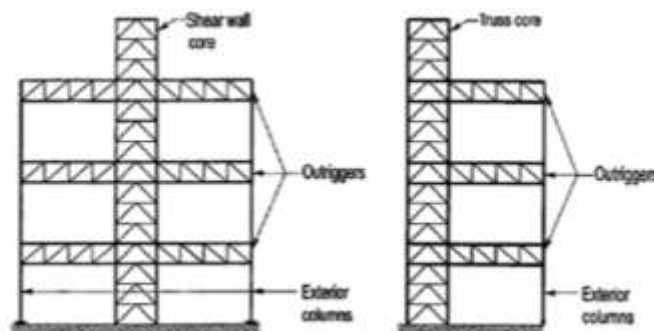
(a) Outrigger system with a central core (b) Outrigger system with offset core
